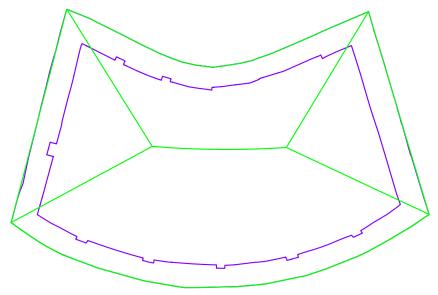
The purple contour of the donjon wall and the green matching roof contour. Source: own ill.
